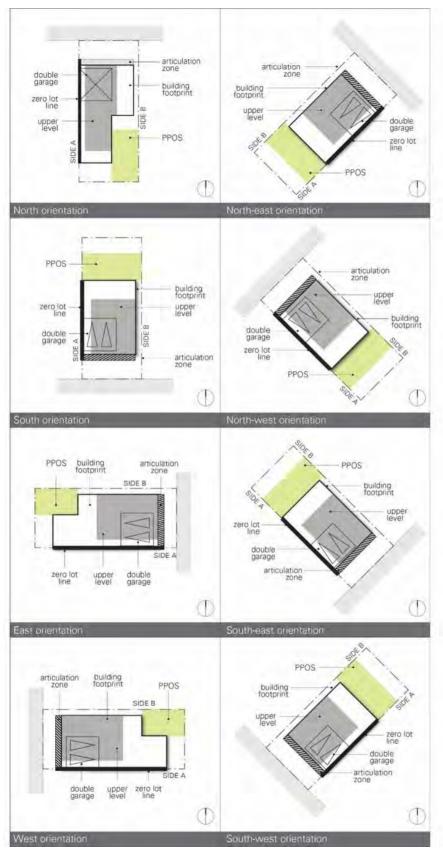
Dwelling and open space siting principles for different lot orientations
